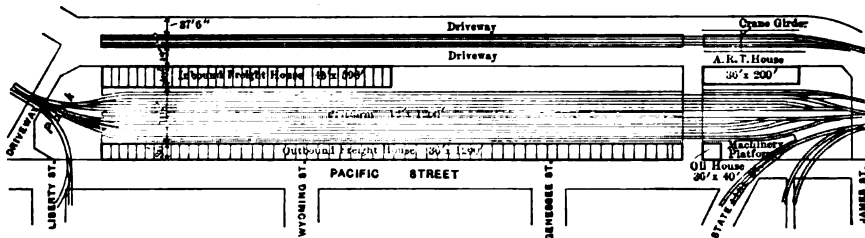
General plan, freight-house lay-out, Kansas City—Missouri Pacific.
